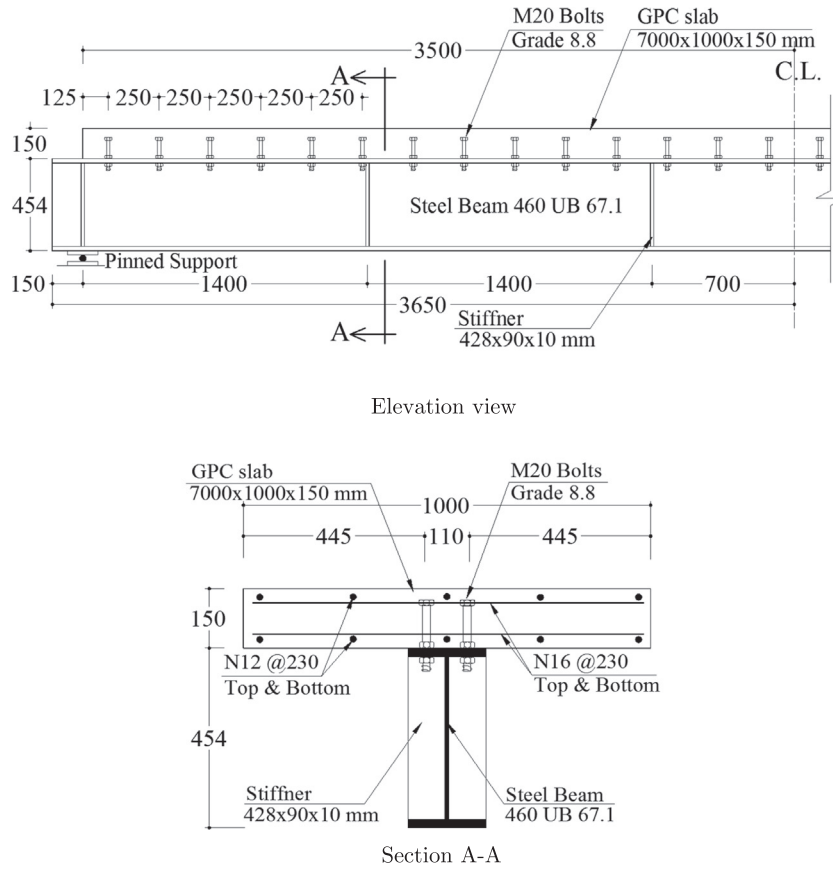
Geometry and details of composite beam CB1 (unit: mm).
